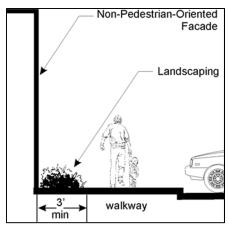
Pathway/landscaping requirements adjacent to nonpedestrian-oriented facades.
